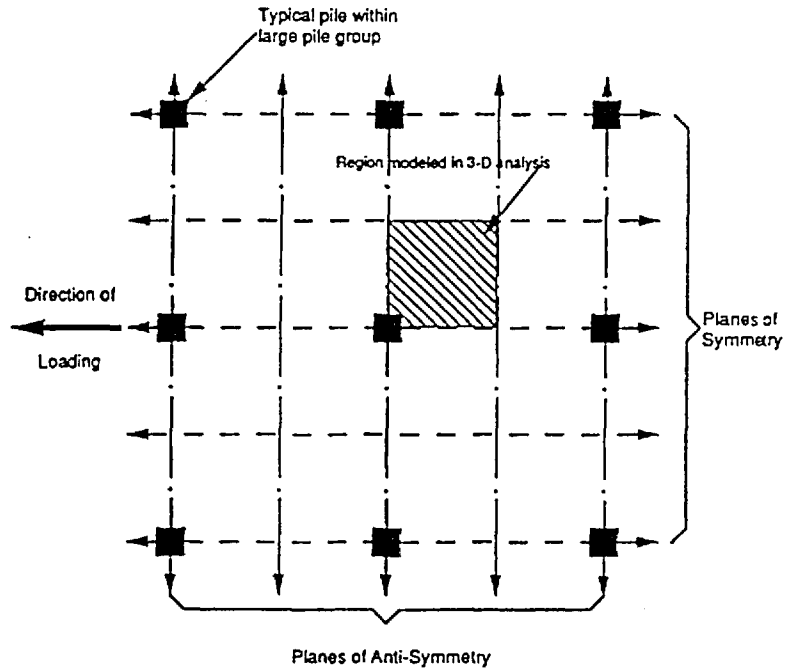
Plan view of portion of large pile group used in 3-D analysis
